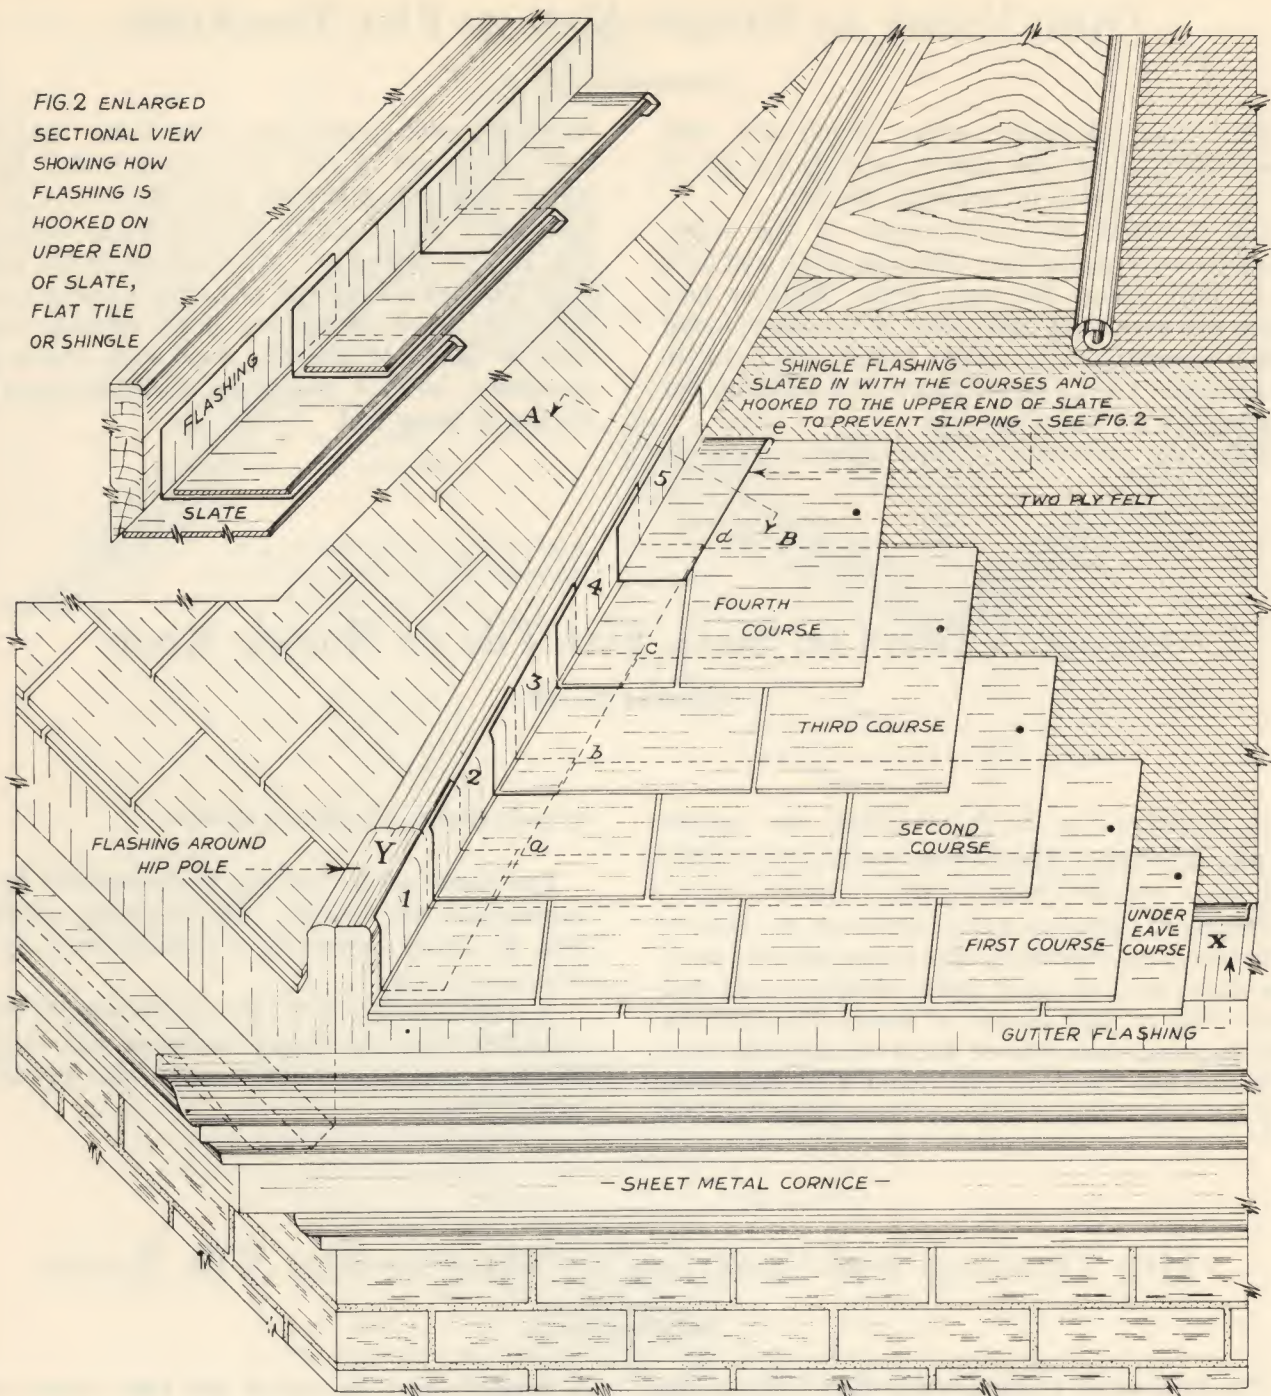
METHOD OF USING SHINGLE FLASHING AT HIP IN CONNECTION WITH SLATE, FLAT TILE AND SHINGLE ROOFING
